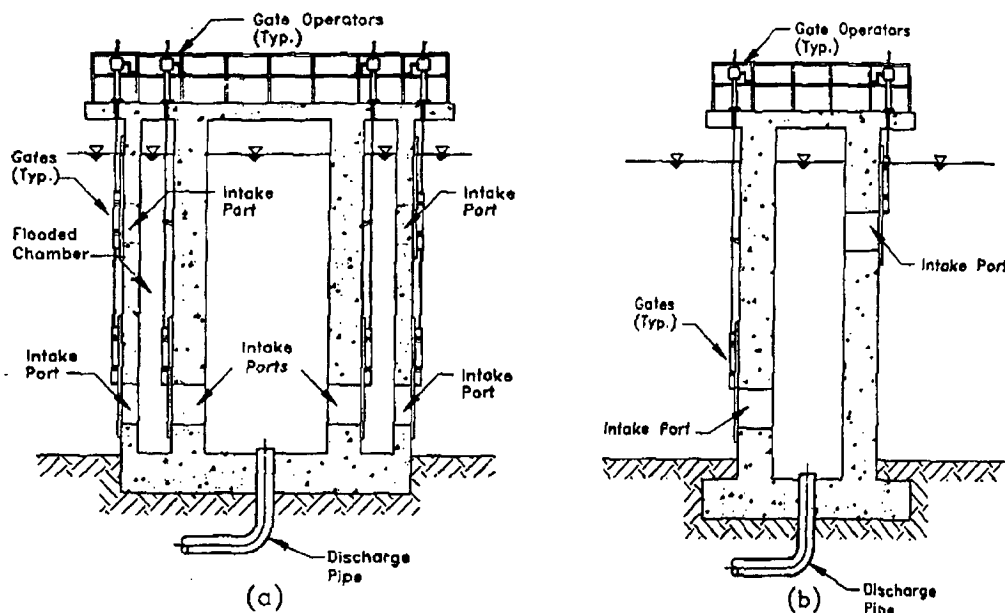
Typical intake towers (a) Wet-intake tower (b) Dry-intake tower
